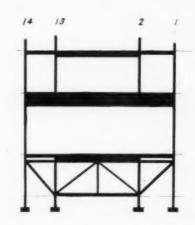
The large girder and the inverted truss were necessary to accommodate the wide show front shown at the upper left corner of this page
